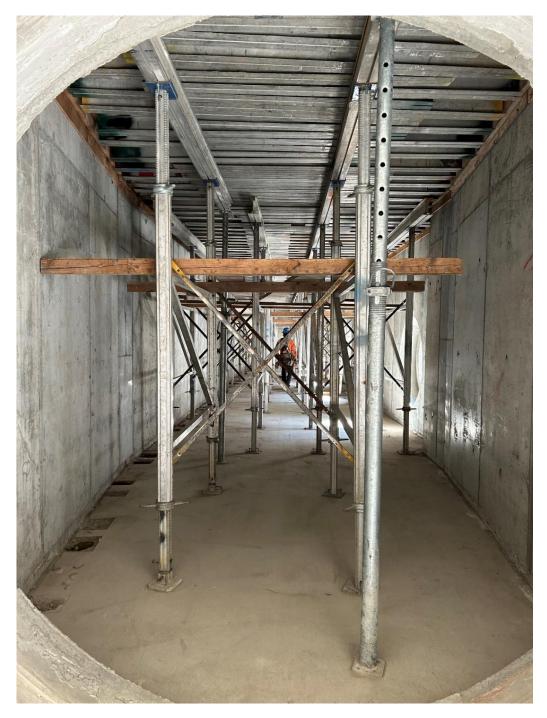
Portal from the 108-inch UV-CCB influent piping into the UV Influent Weir Structure. The aluminum shoring and decking shown in the photo supports the weight of the concrete roof until it attains proper strength after curing. The UV Influent Weir Structure will provide even flow to each of the UV vessels located in the UV Room to the right of the photo.
